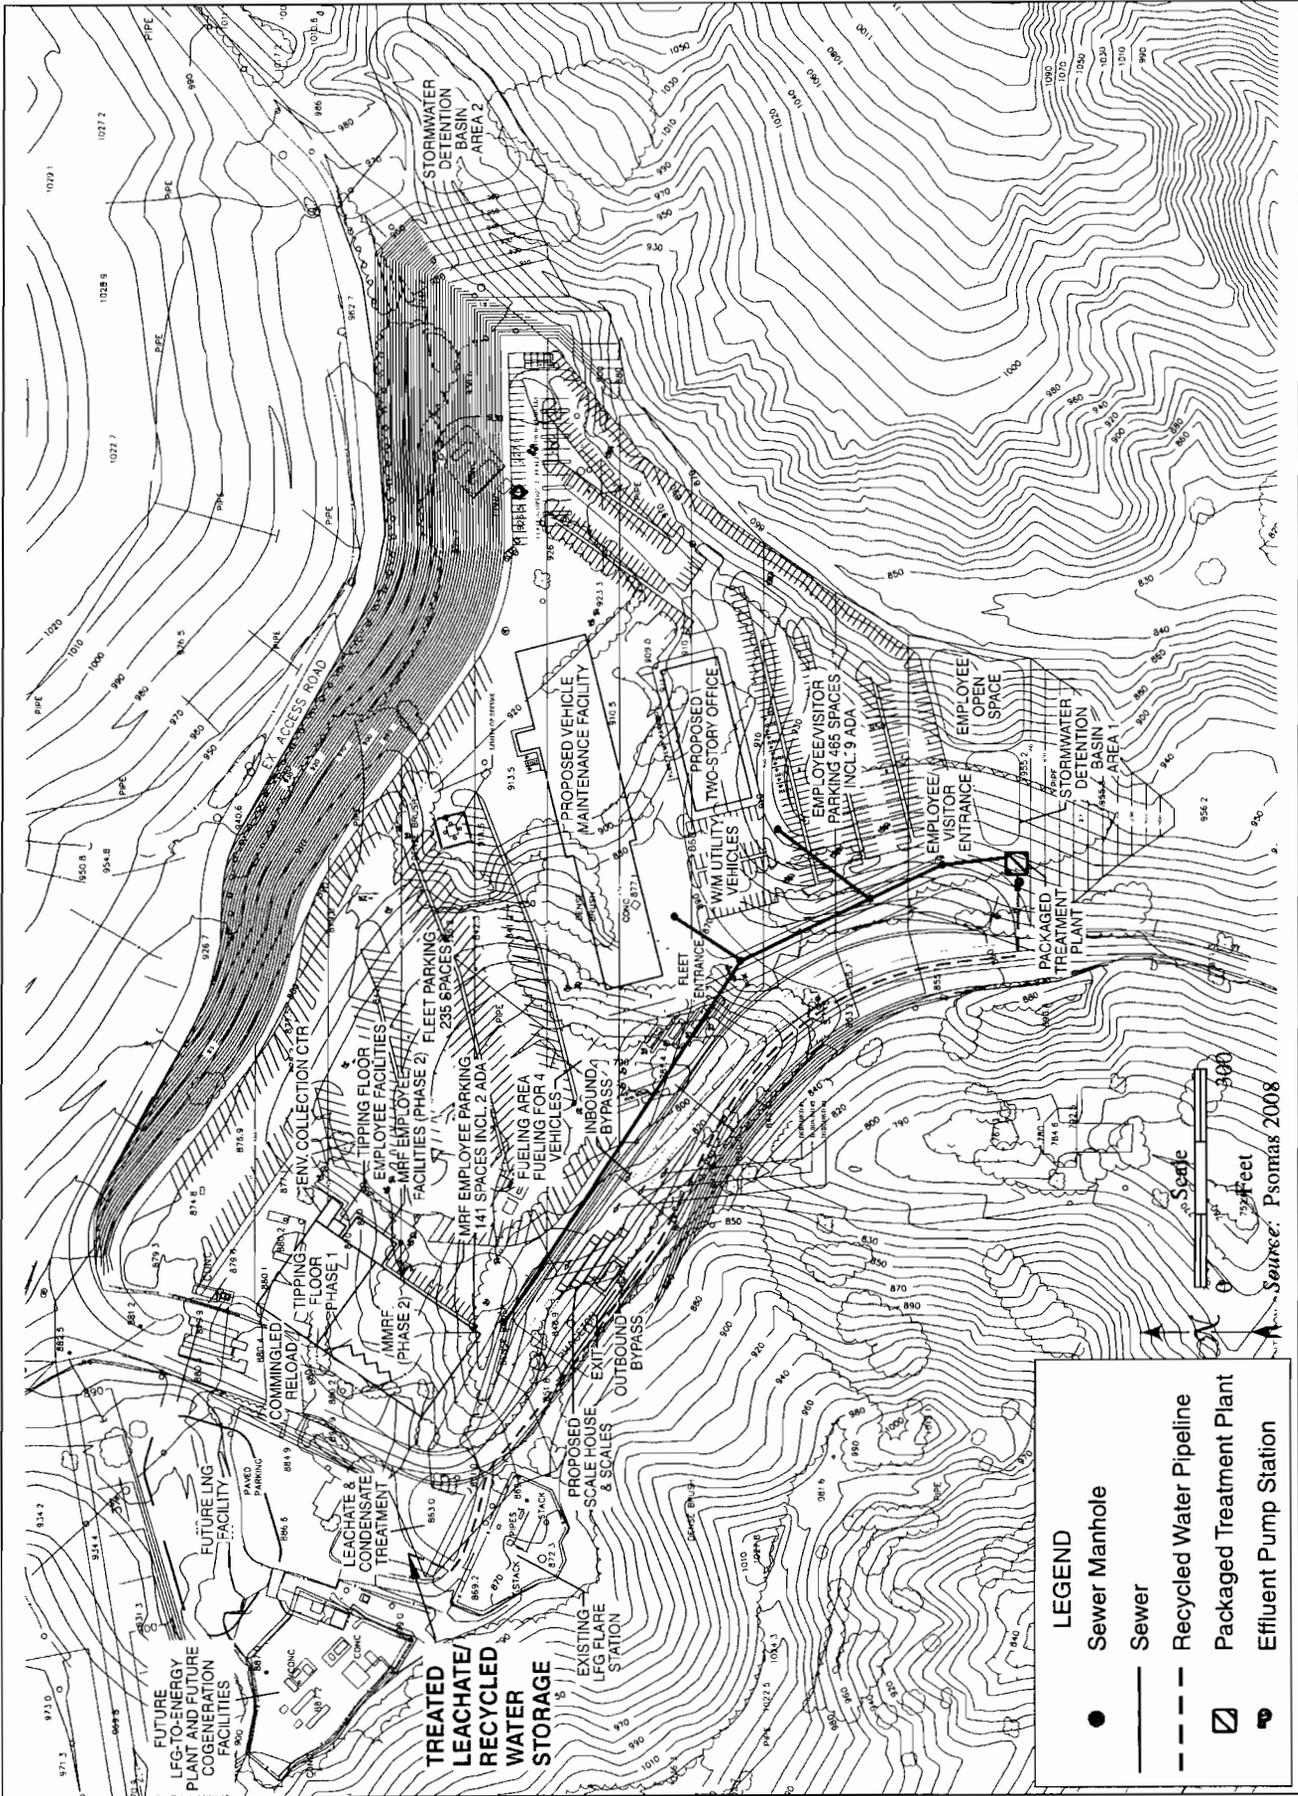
Site Plan for the Proposed Support/Auxiliary Facilities Area
